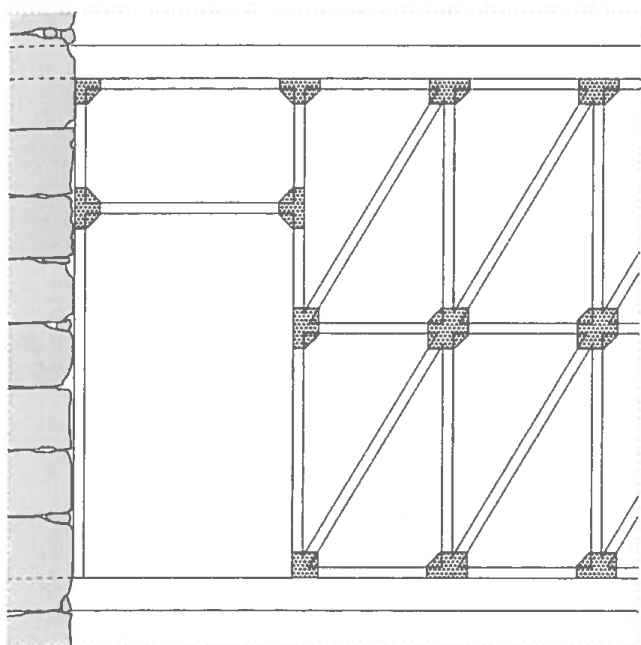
Reinforcement of joints in the structure of a wooden wall.
